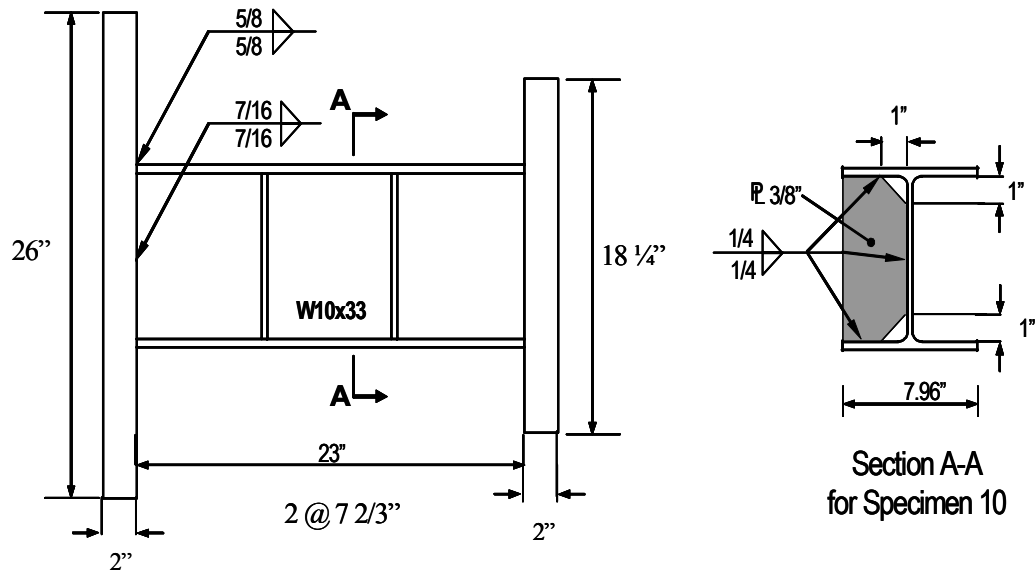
Welding and stiffener details for Specimen 9
